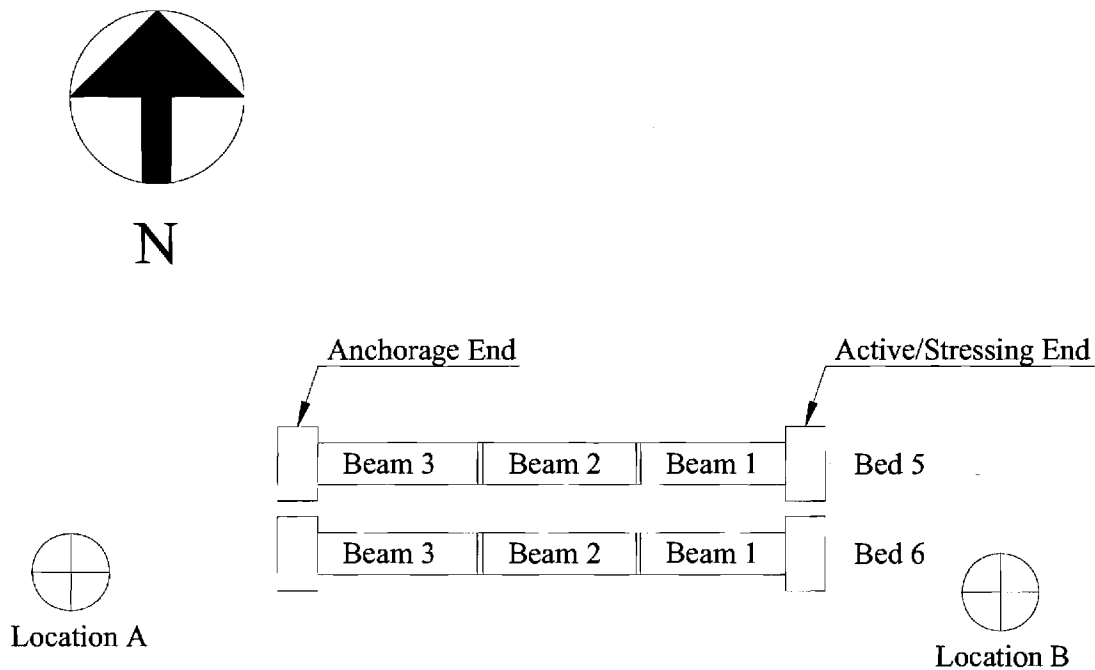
Plan view of Standard Concrete Products plant girder beds
